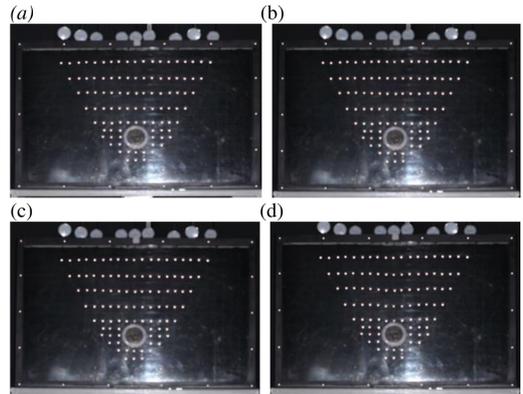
Ground deformation of tunnel excavation (unreinforced model tunnel), (a) $V_L = 5\%$, (b) $V_L = 10\%$, (c) $V_L = 18\%$, (d) $V_L = 40\%$.
